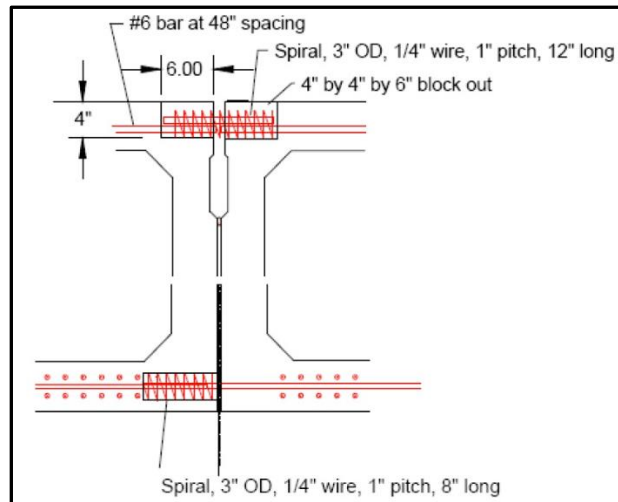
Rebar Details in Shear Key Between Box Beams (PCI Committee on Bridges, 2009)
